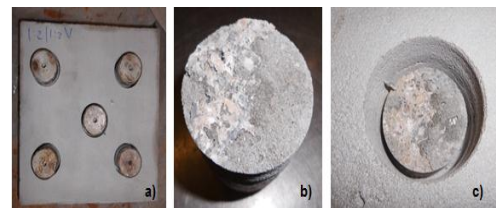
Paving slab with 5 test samples (a), after the specimens pull-off test (b) after the paving slab pull-off test (c).
